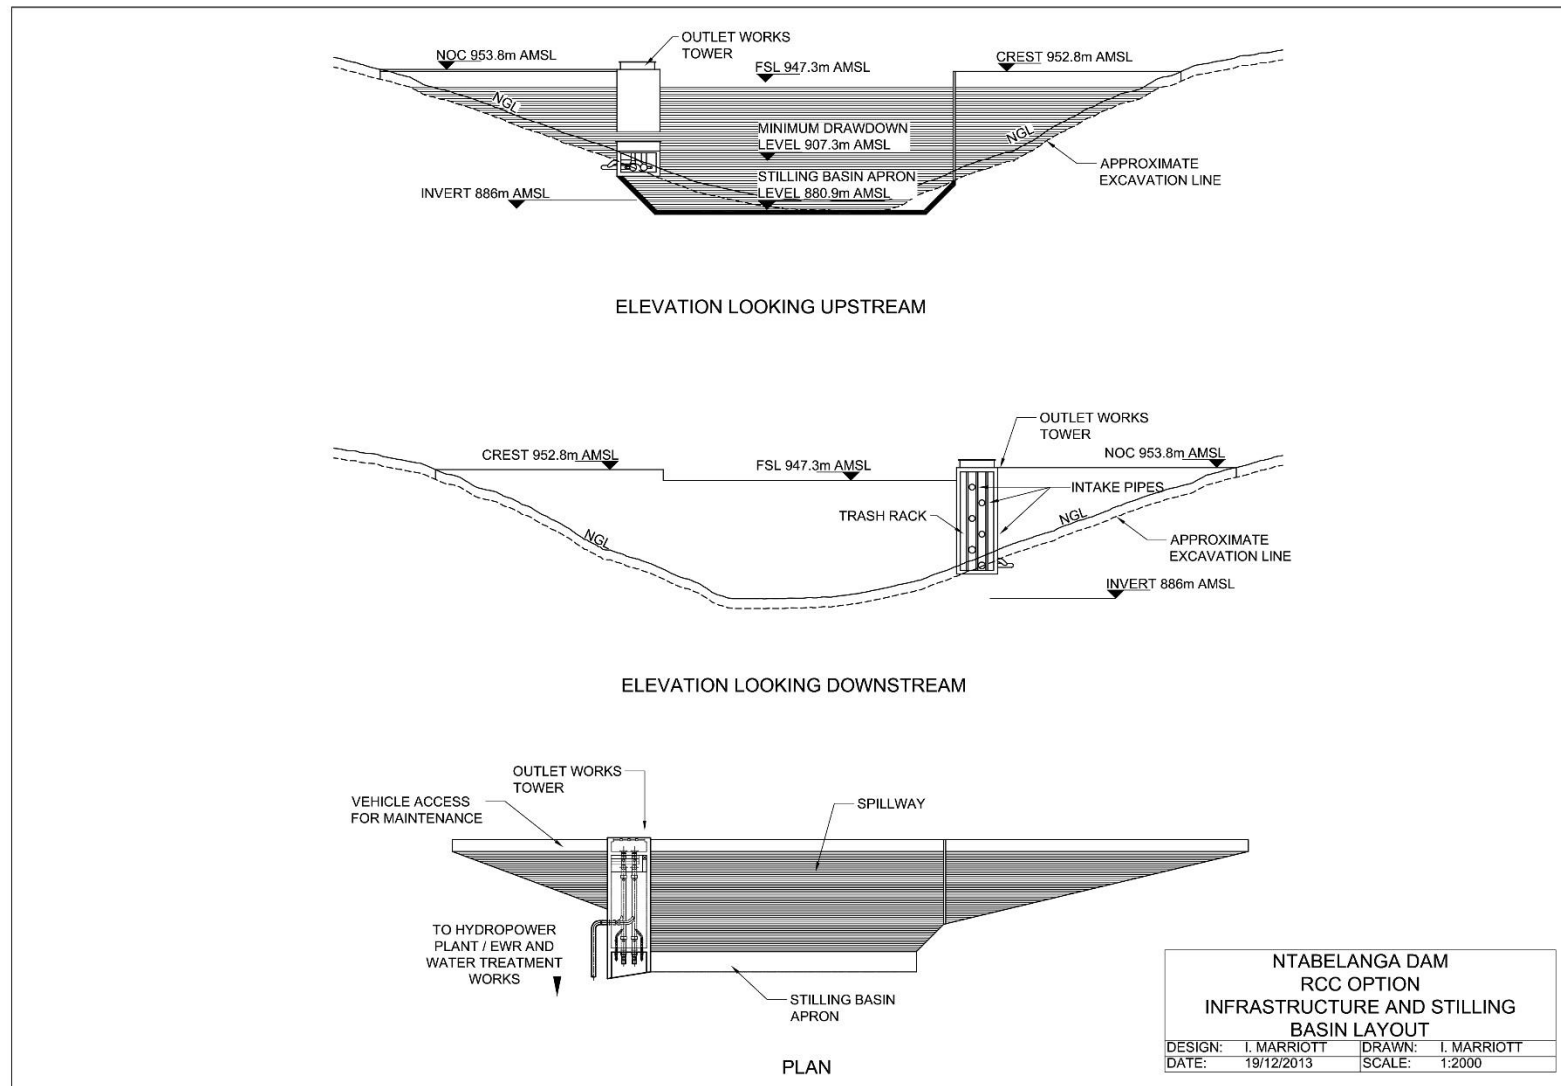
RCC Dam Embankment Plan and Longitudinal Elevations
